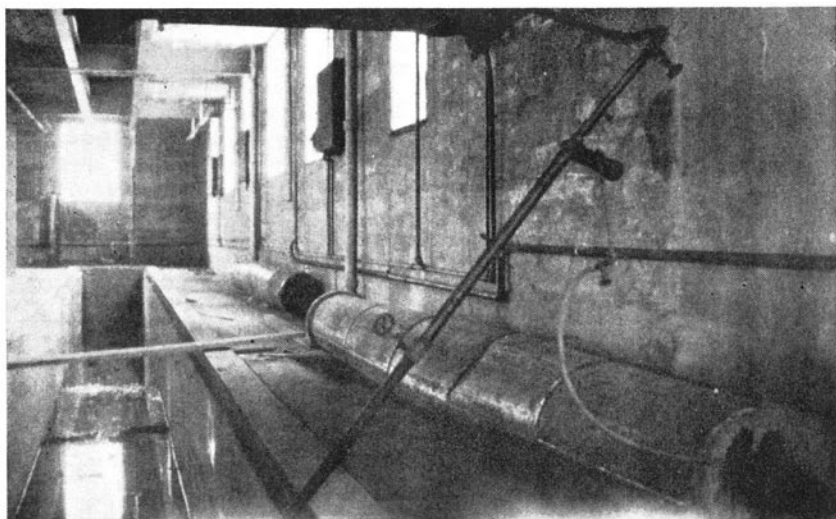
VIEW OF 18-INCH STEEL PIPE AFTER COLLAPSE
